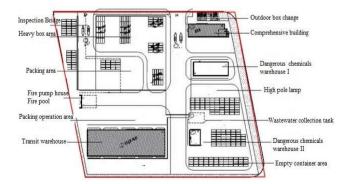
Structural site area of hazardous chemicals warehouse enterprise
